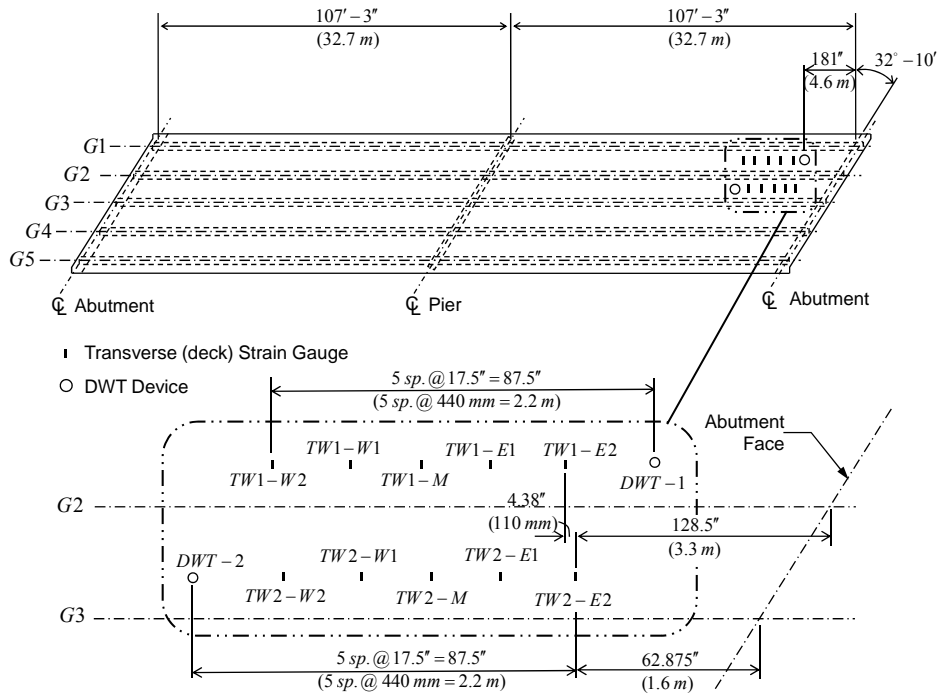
Bridge B-20-133 Plan and Instrumentation Layout.
